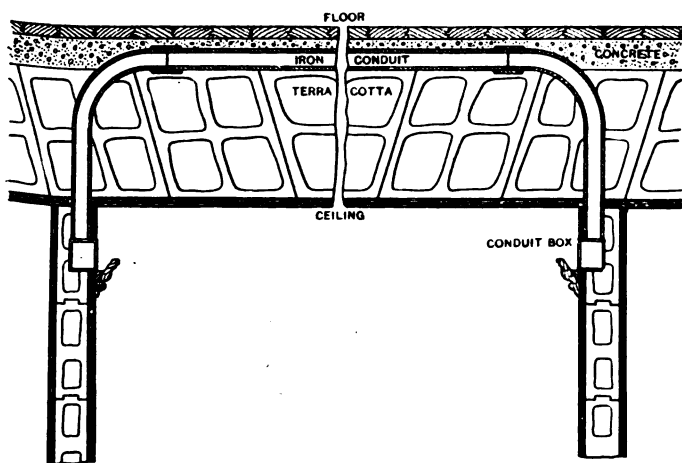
METHOD OF PLACING IRON CONDUIT ACROSS CEILING OF HALL.
